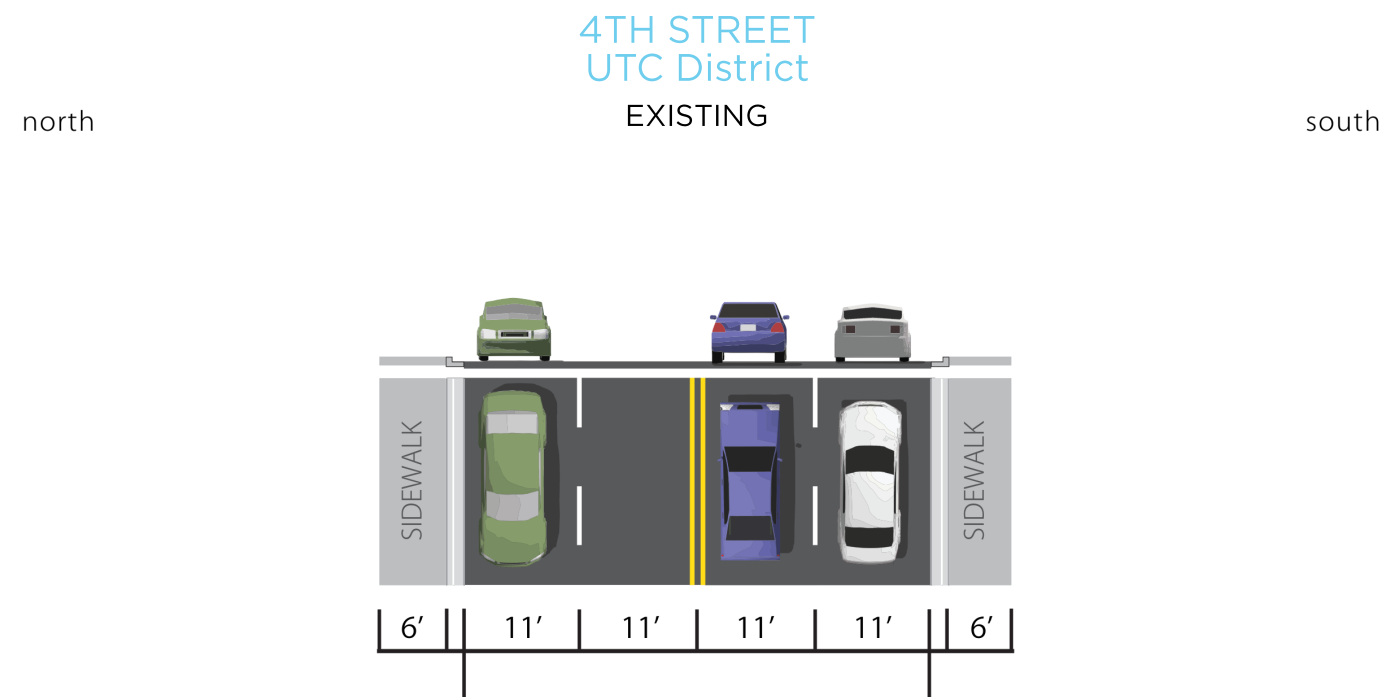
4th Street Cross-Section | UTC, Existing
